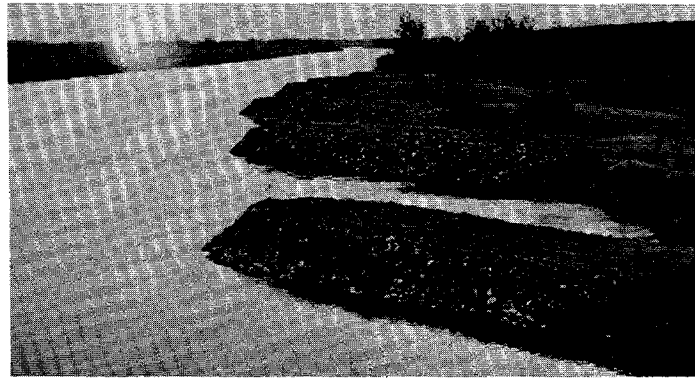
View, looking upstream, of spurs at PH-5 bridge, in 1961.
